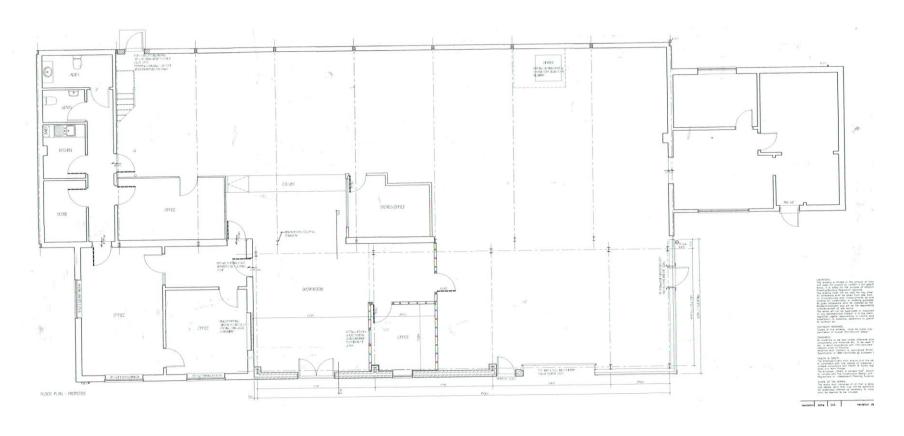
Plan showing the proposed layout of the development site at an original scale of 1:50 at A1, (not to scale), (extract from Architects plan)
